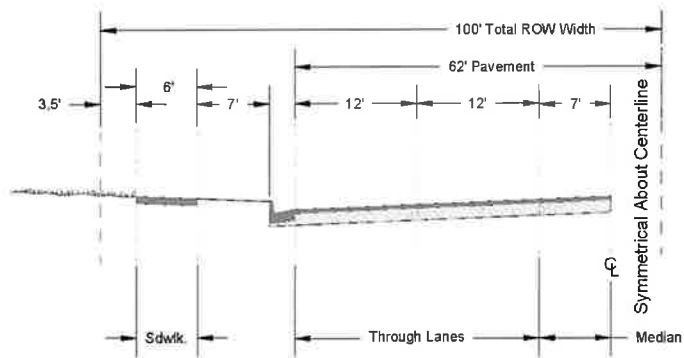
Typical Urban Principal Arterial Cross Section (4 Lane)
